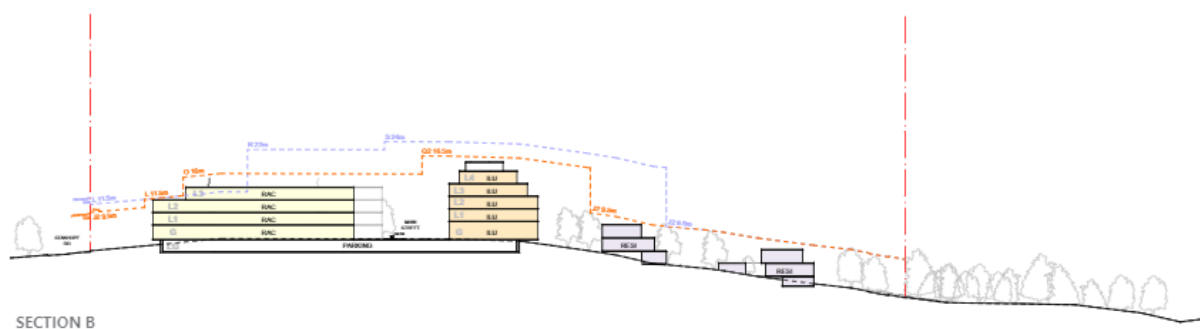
Section plan showing proposed illustrative masterplan development and setback from Stanhope Road
